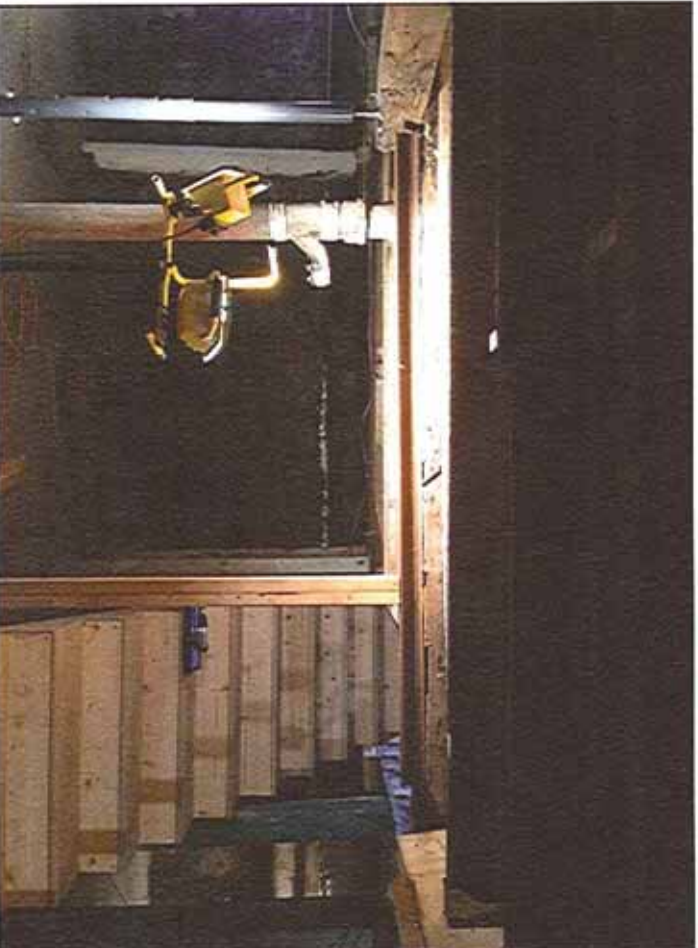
Steel W-beam possibly shoring existing support beam; shoring unstable as installed.
